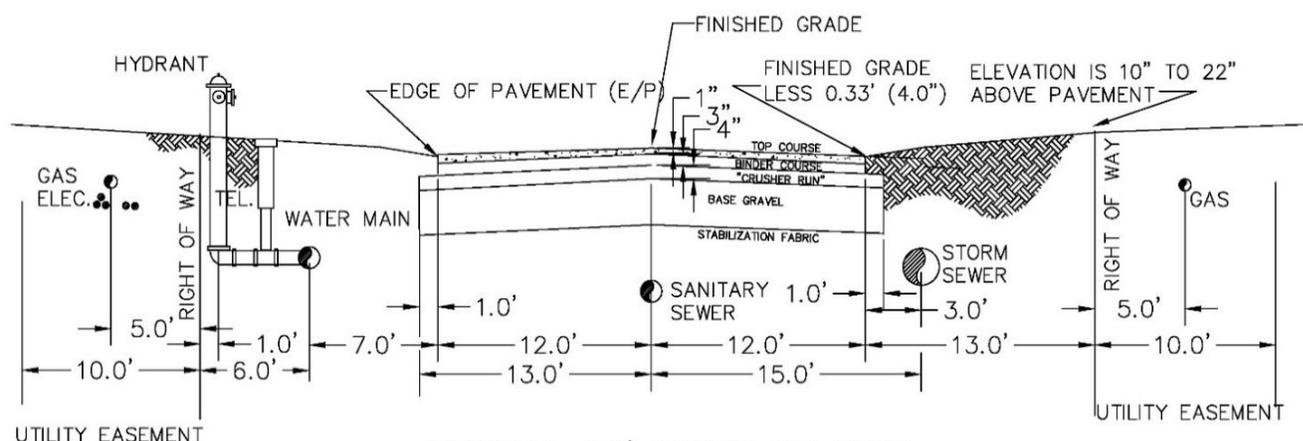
Town Road Cross-Section showing location of underground utility infrastructure.
